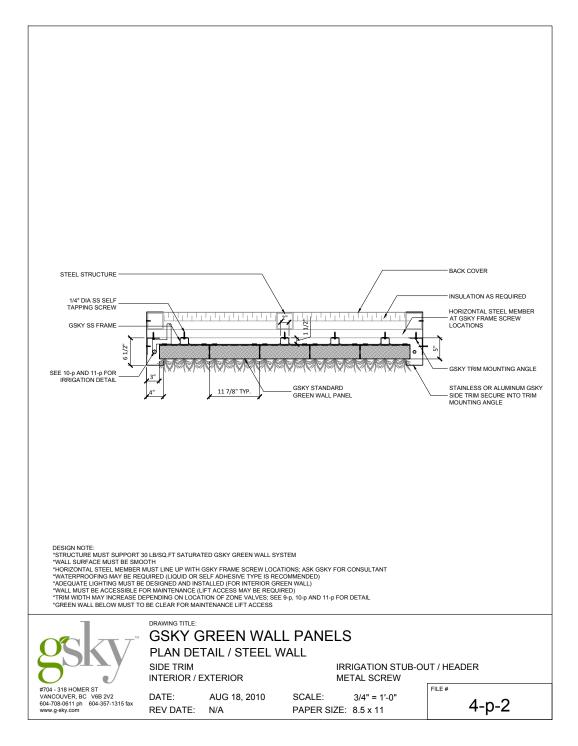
PLAN DETAIL/STEEL WALL http://gsky.com/green-walls/pro/cad-spec/
